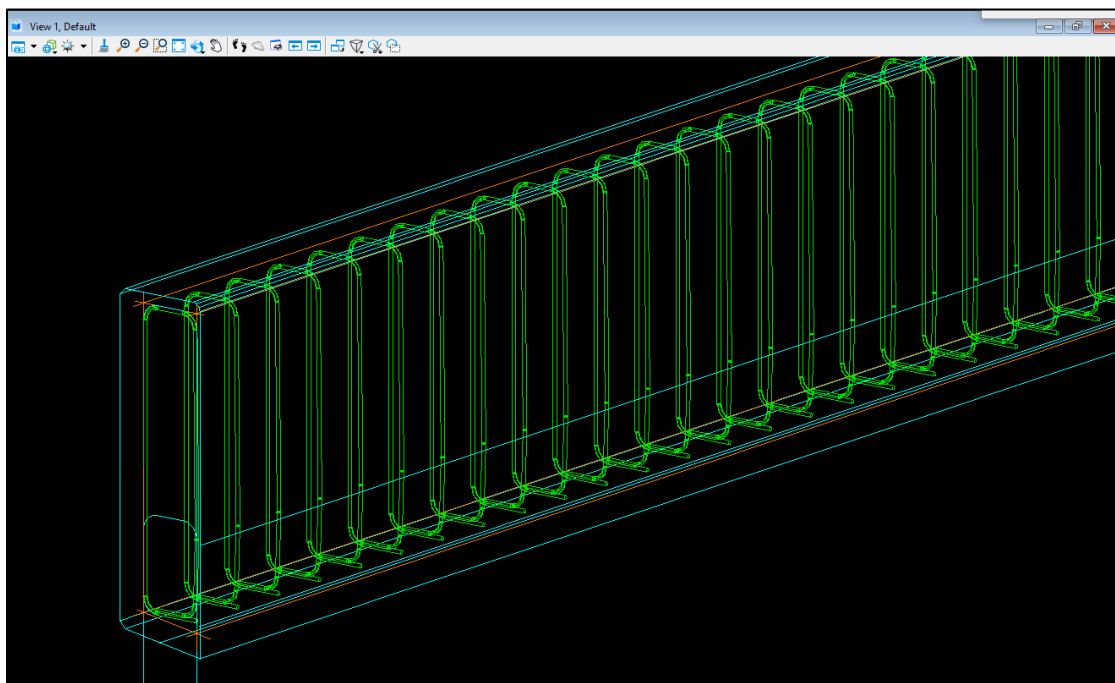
42" Vertical Wall Barrier Reinforcement
